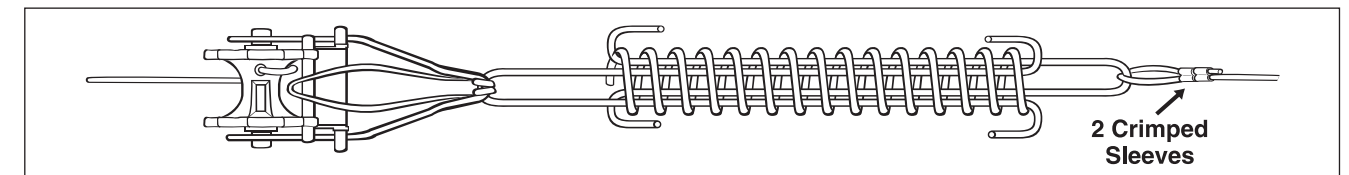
Thread free end of fence into strainer spool and ratchet to tighten.
